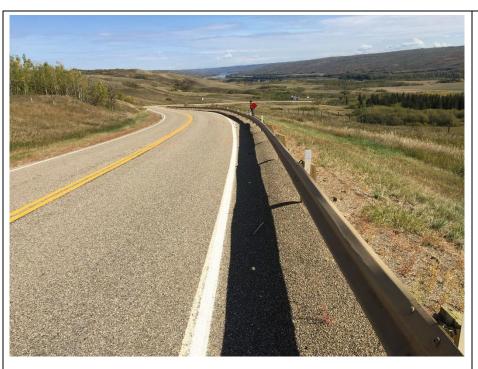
Looking NE from SBL shoulder towards new landslide cracks.
